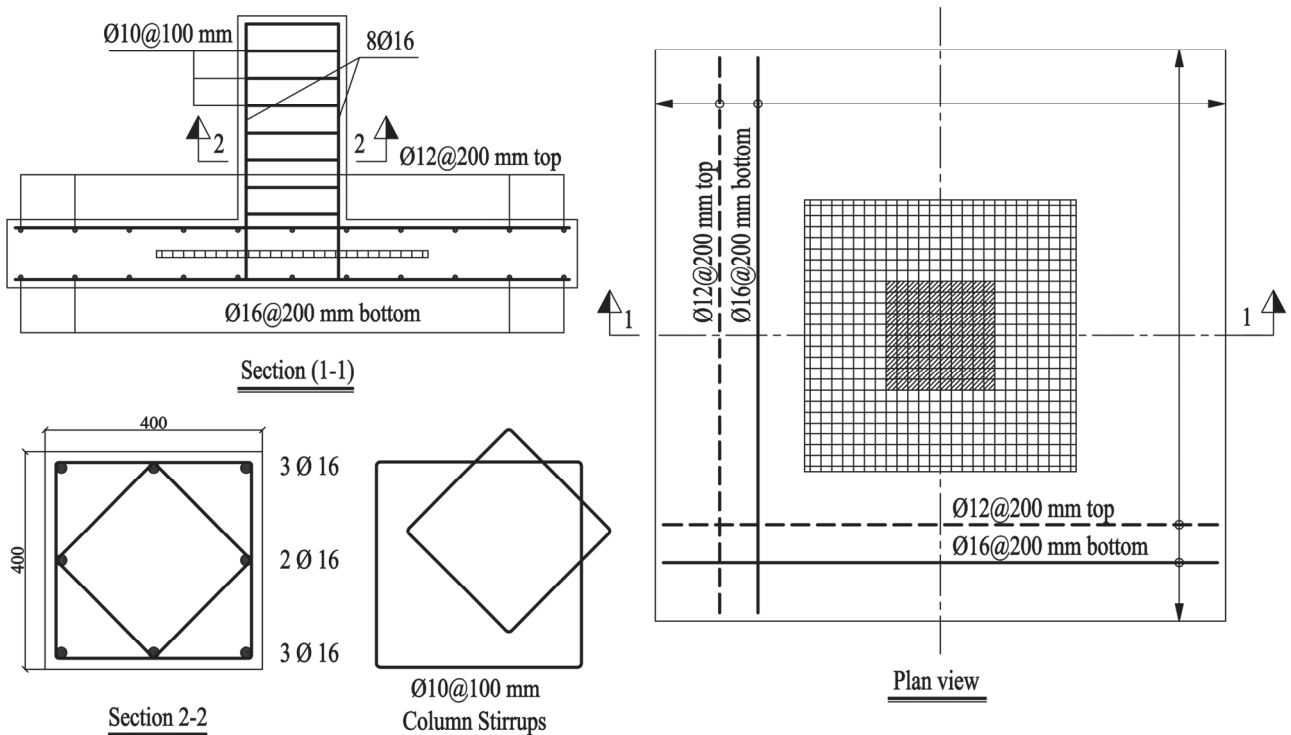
Typical reinforcement details of the control specimen for the parametric study.
